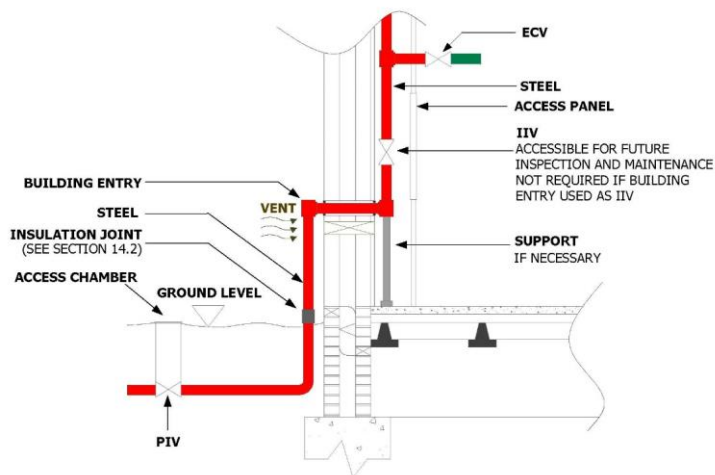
TYPICAL ABOVE-GROUND PIPELINE BUILDING ENTRY (STEEL PIPE)
